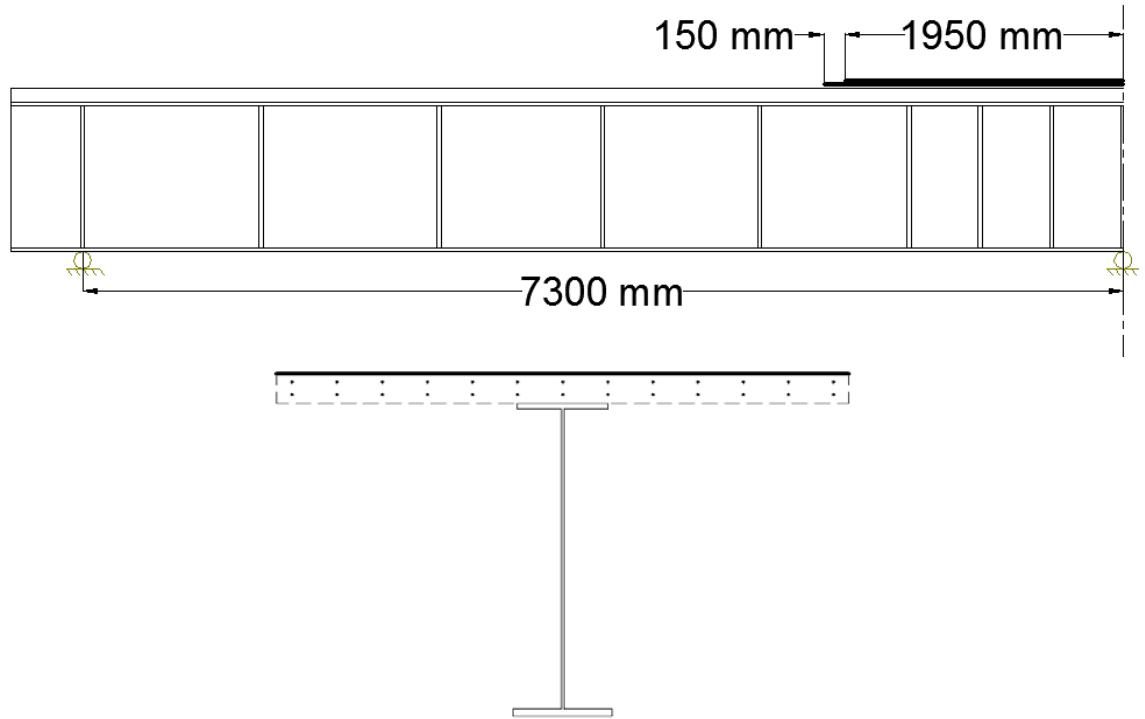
Elevation and cross section at interior support zone of the retrofitted girder
